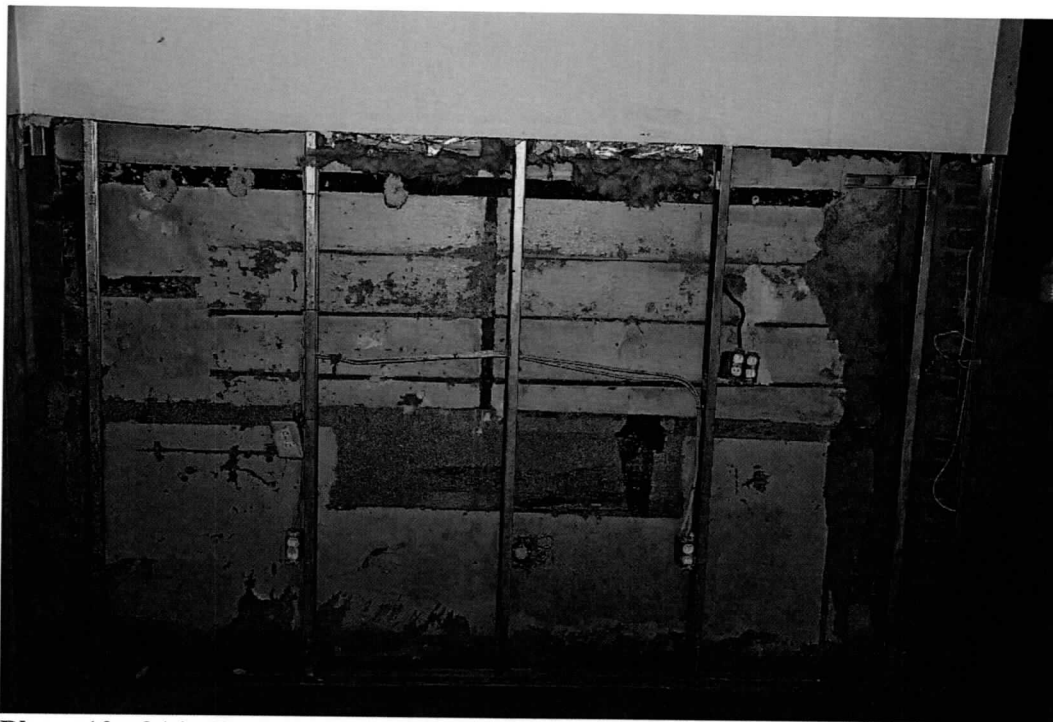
of 14: Basement, north wall in center, with shelf ghosts. 9/8/2016
